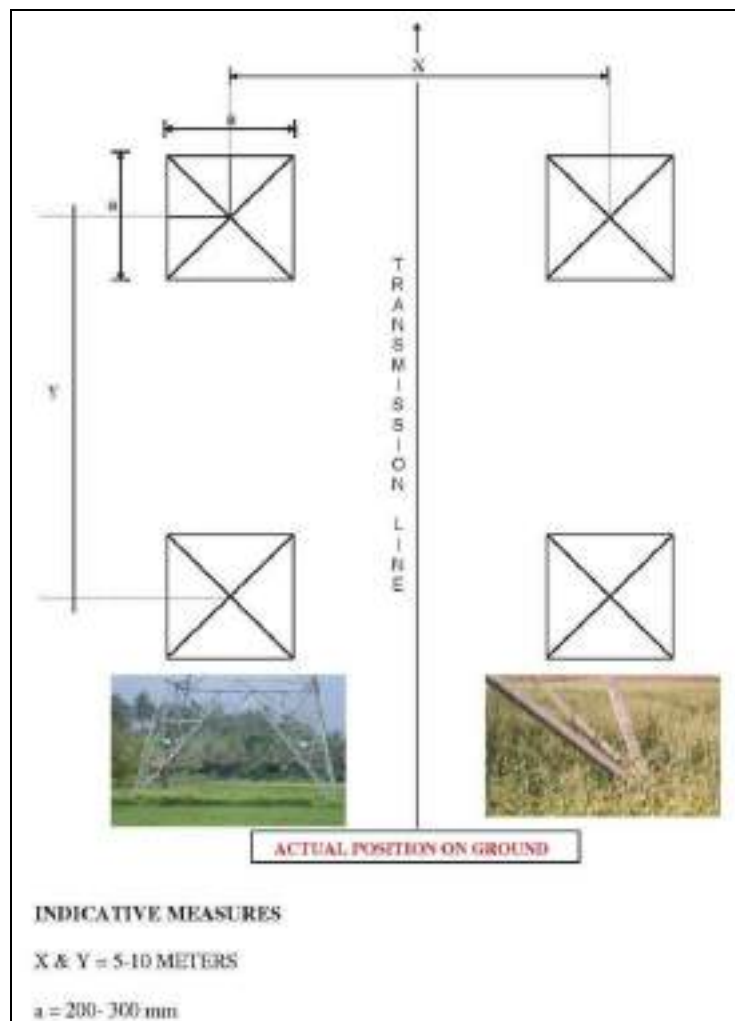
Typical Plan of Transmission Line Tower Footing
